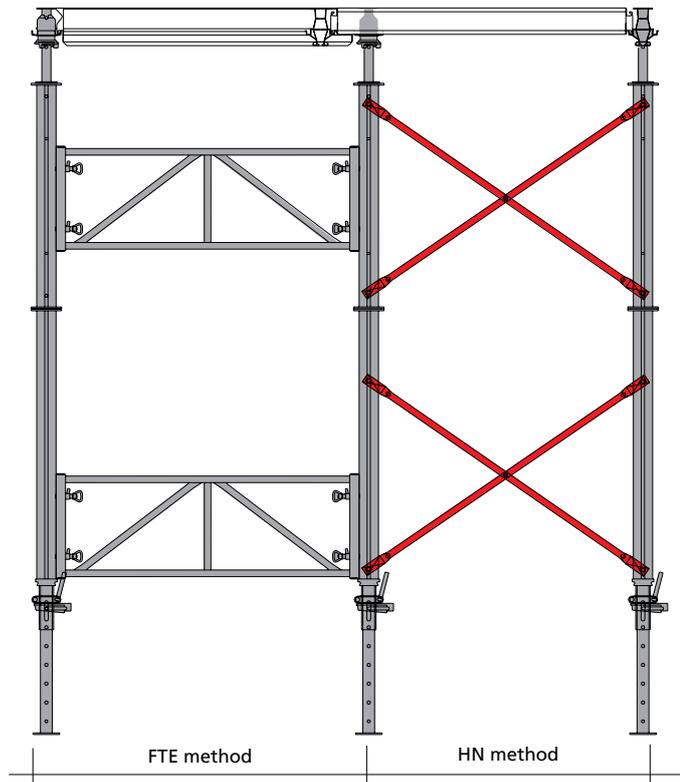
Example: MEP shoring tower with MevaDec for rooms higher than 4,90 m
